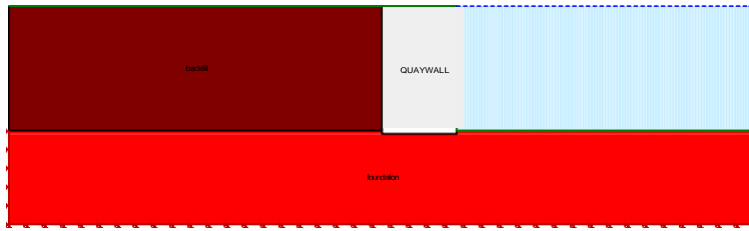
A quay wall model without reinforced backfill and foundation soils (Case A)
